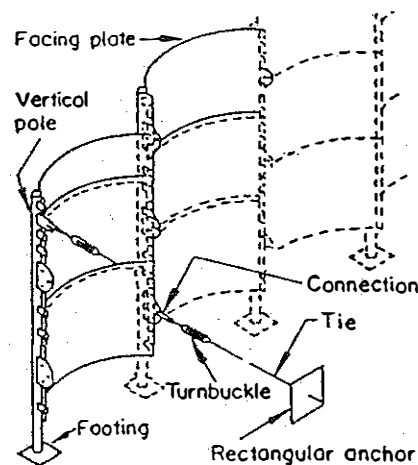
(a) Use of rectangular plate anchors (Japanese system)
